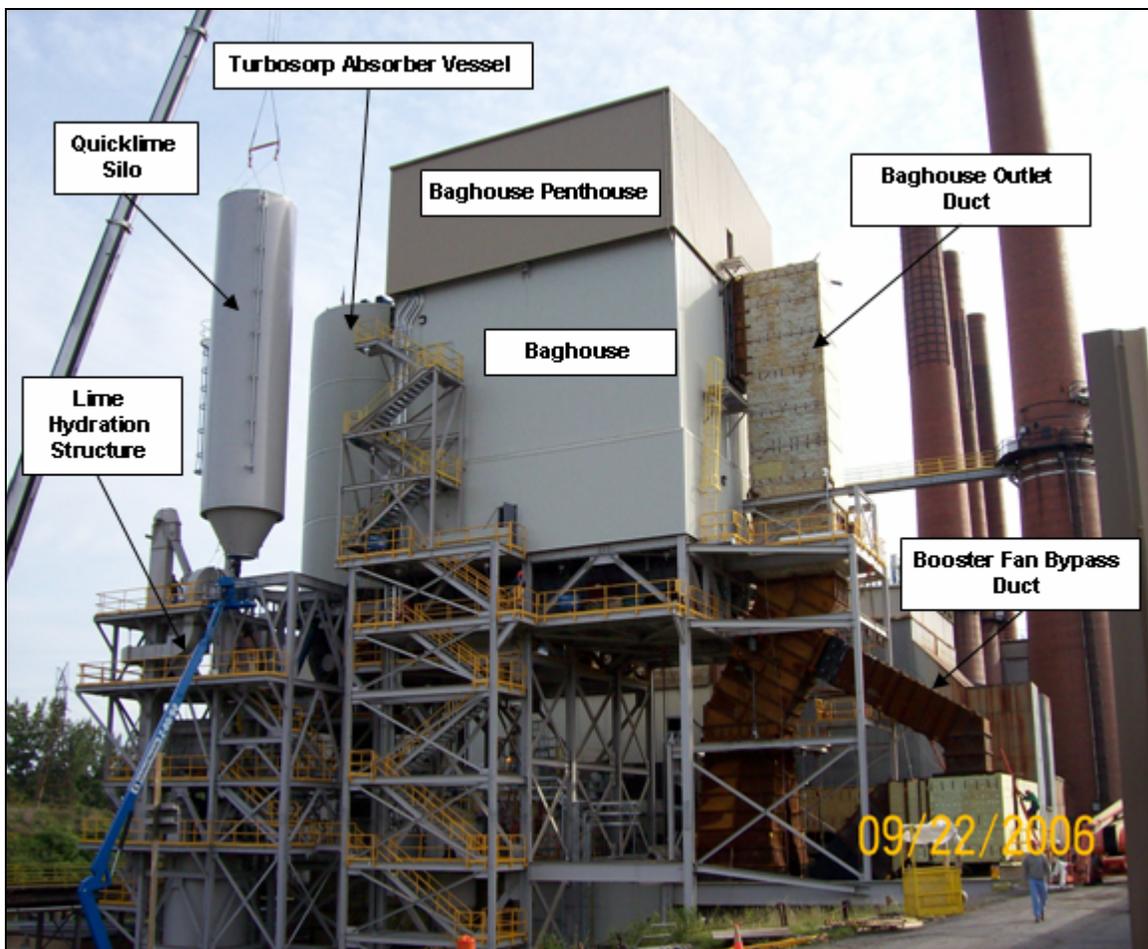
Photograph showing construction progress at the AES Greenidge site as of September 22, 2006.
